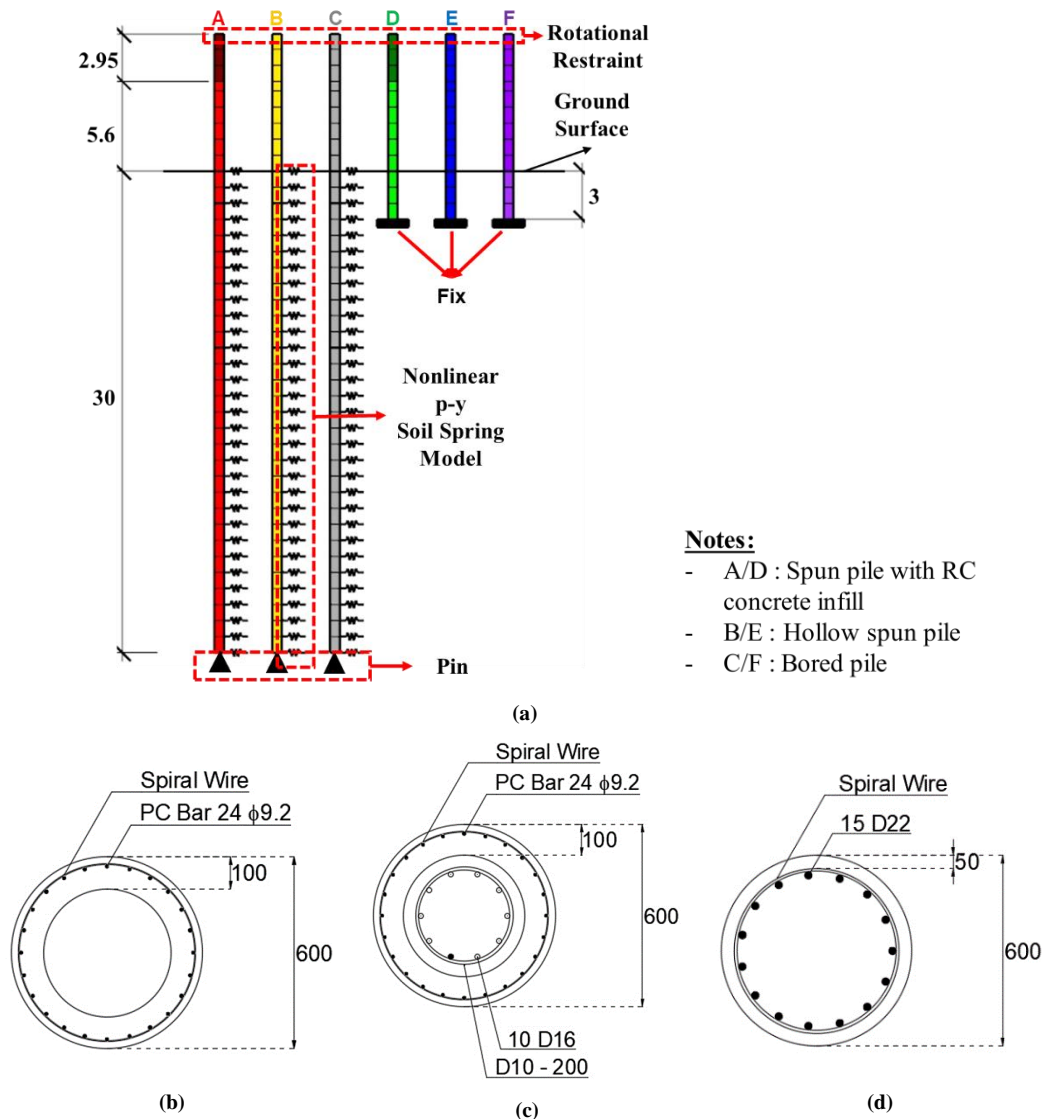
Modeling schemes for the single pile-column: (a) single pile models idealization (unit in m), (b) hollow spun pile (unit in mm), (c) spun pile infilled with reinforced concrete (unit in mm), and (d) bored pile (unit in mm)
